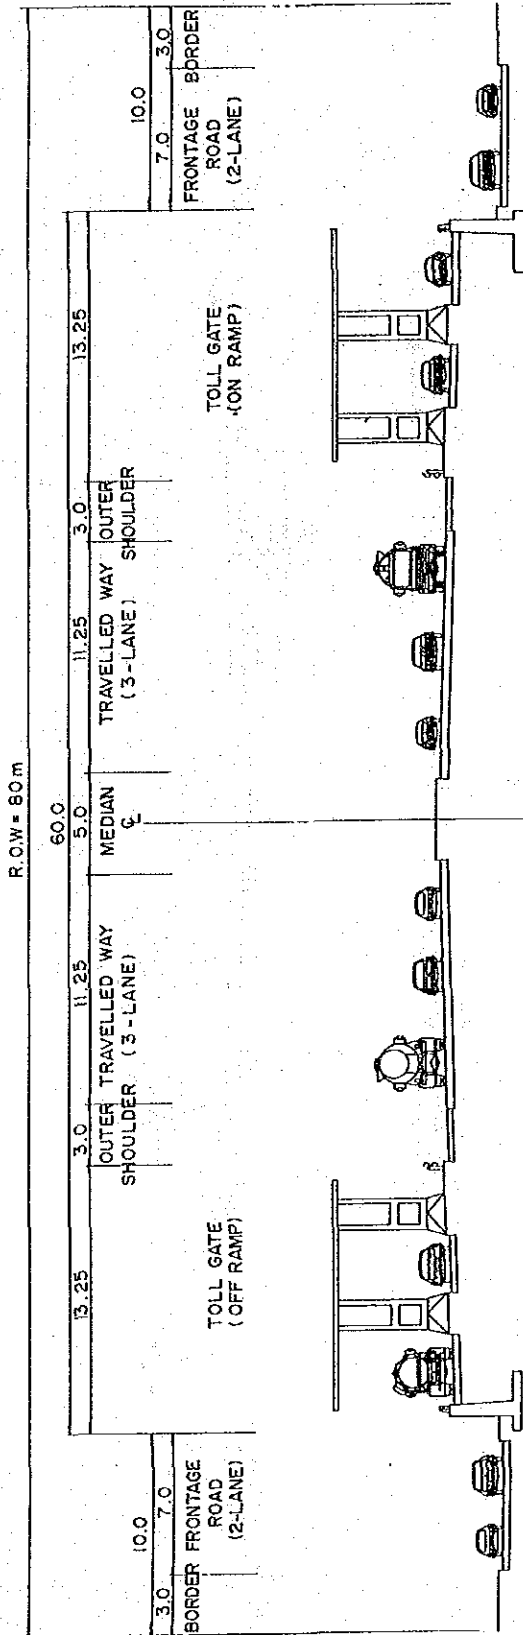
TYPICAL CROSS-SECTION OF 6 - LANE ROAD WITH FRONTAGE ROAD. LEGEND:
